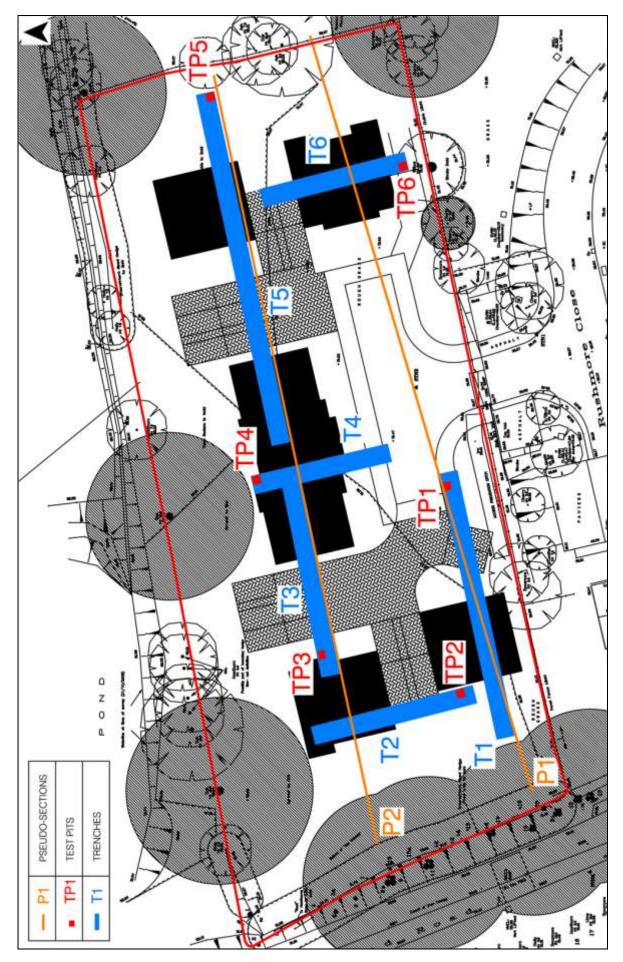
Site plan showing location of archaeological evaluations, tree protection orders (hatched) and proposed development (scale 1:400)
